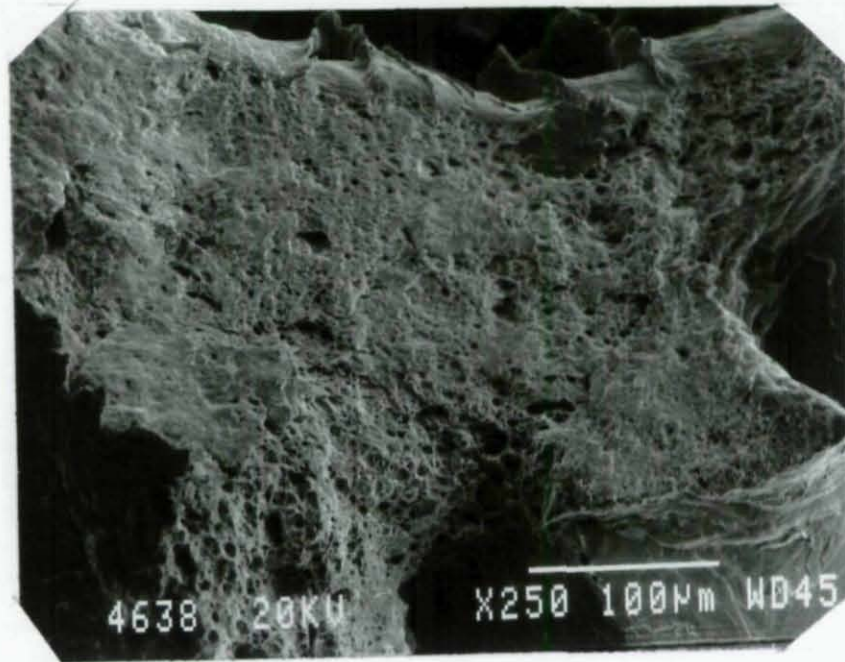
Fracture surface of the north end from the west-beam bottom-flange joint.
